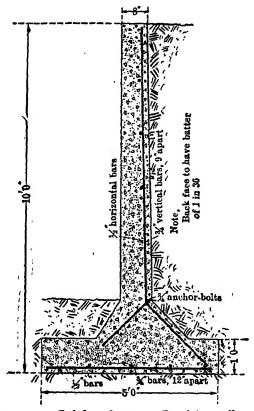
B Reinforced-concrete Retaining-wall, 10 ft High
